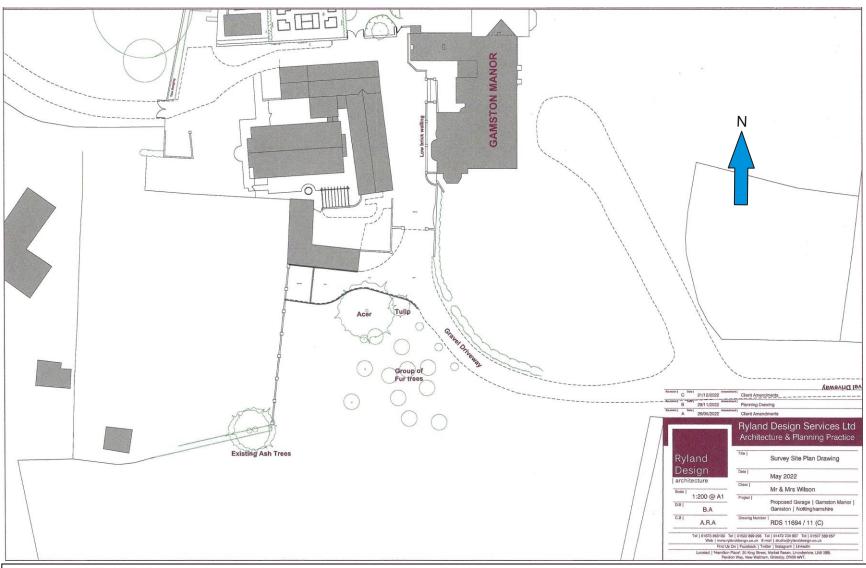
Plan showing the existing layout of the proposed development site at an original scale of 1:200 at A1, (extract from Architects plan).
